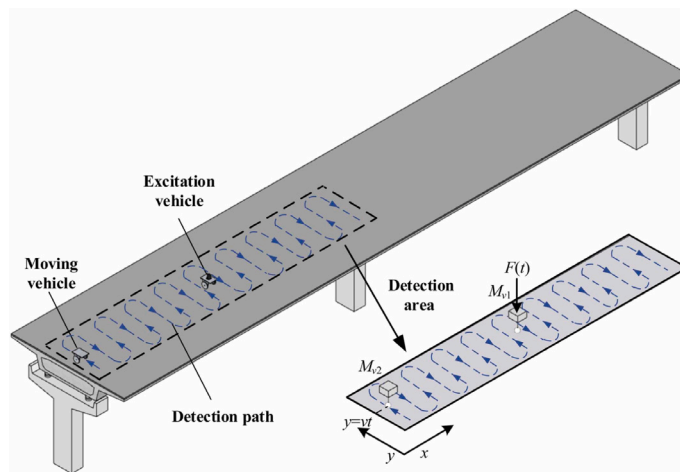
Schematic diagram of the deck damage detection of box girder bridges in [281].
